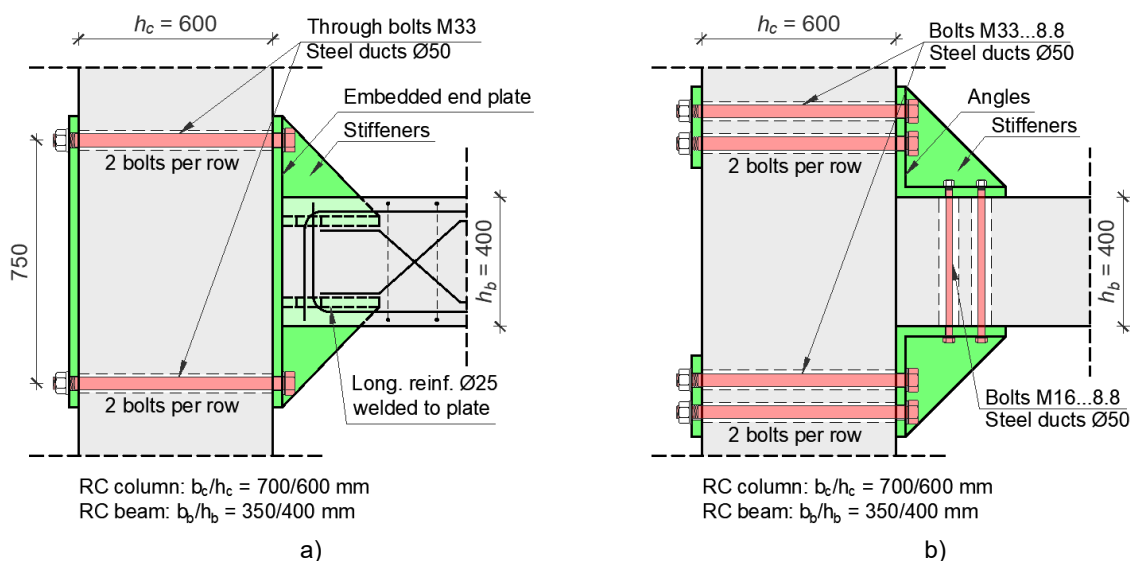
Moment beam-to-column connections with through bolts: a) connection with embedded steel end plate and stiffeners (adapted from Aninthaneni et al. [34]); b) connection with steel angles and stiffeners (adapted from Aninthaneni et al. [36])
